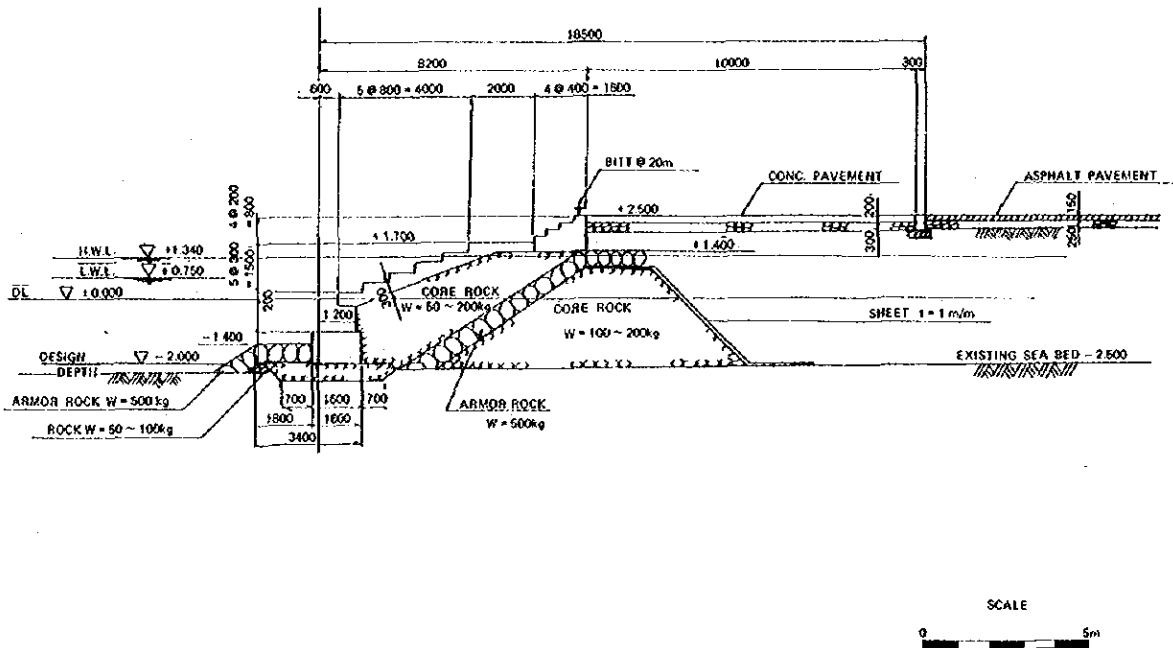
Cross Section of Stair Landing – Iloilo Port
